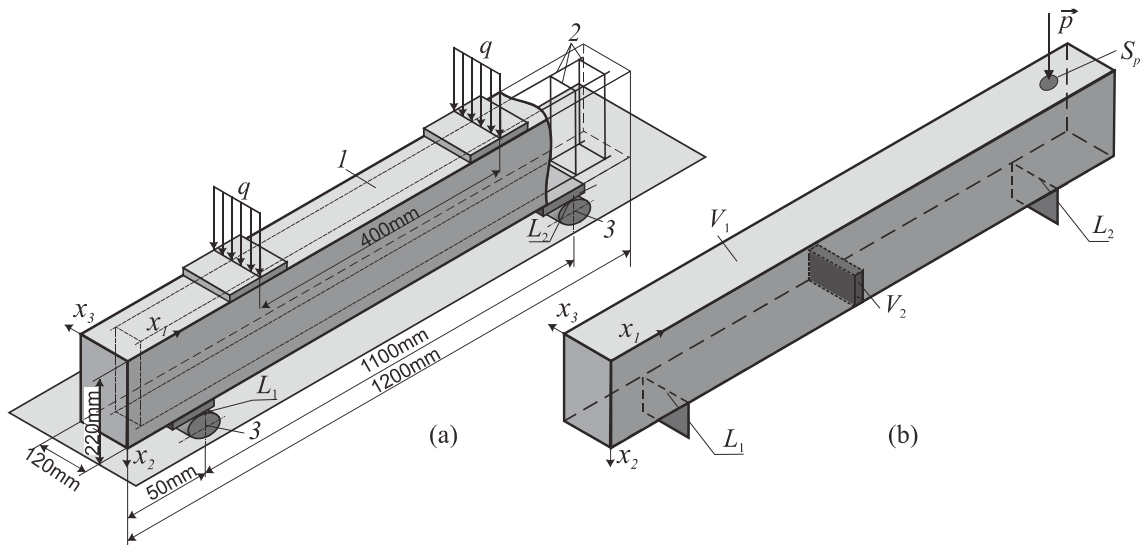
Four-point bending of reinforced concrete beam (a) and the calculation scheme of the beam with a crack (b).
